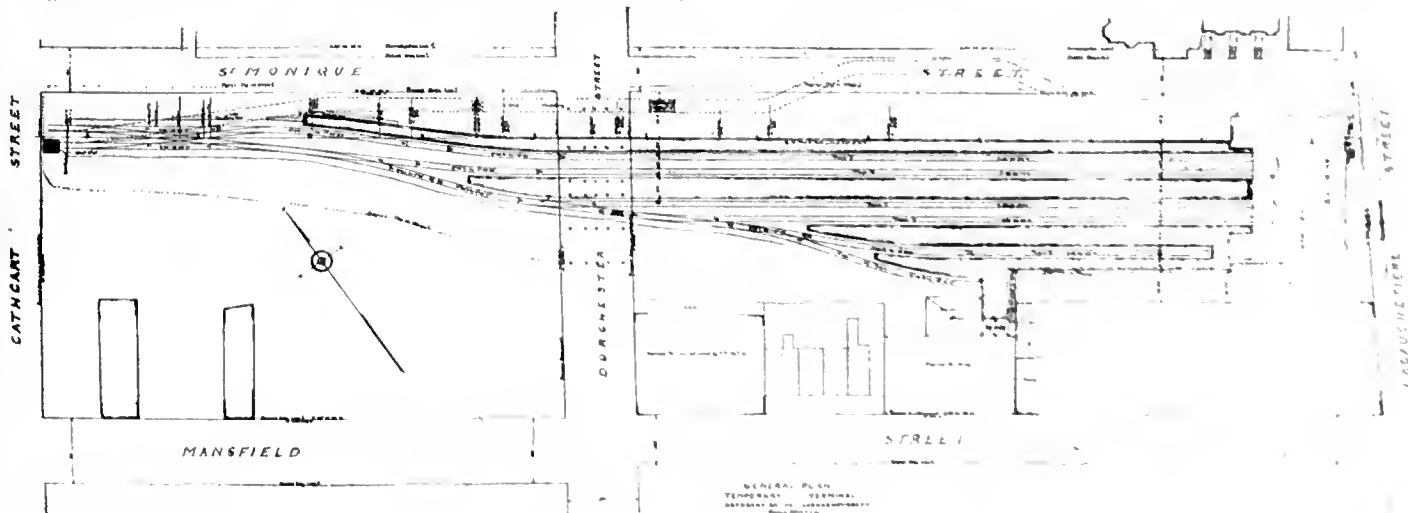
General plan of C.N.R. terminal facilities at Montreal. East portal of tunnel is at Cathcart St. Tracks to east of tunnel are carried in an open cut.
